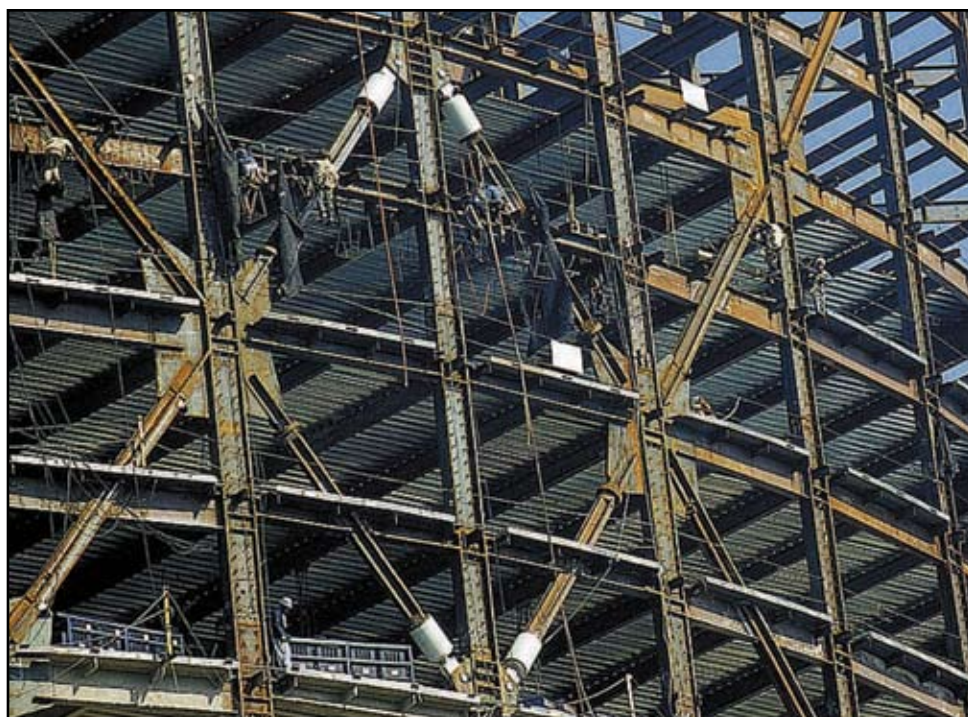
Damped Link Element acting as coupling element between independent trusses, Torre Mayor, Mexico City.
